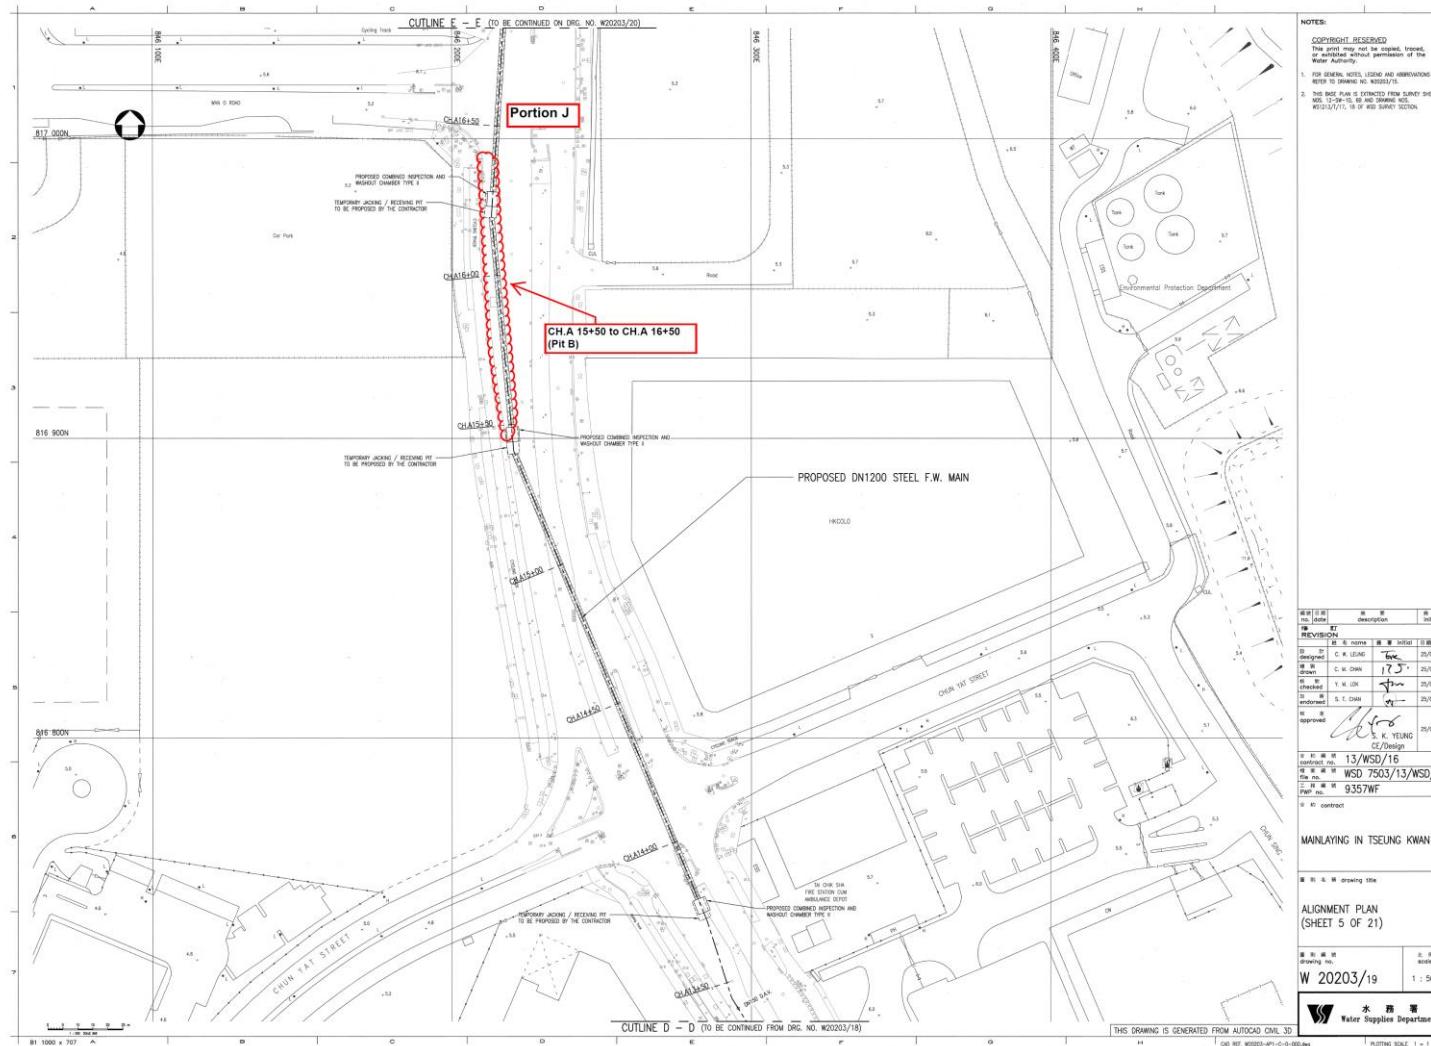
Location Plan for Portion J – CH. A15+50 to CH.A 16+50 (Pit B)
